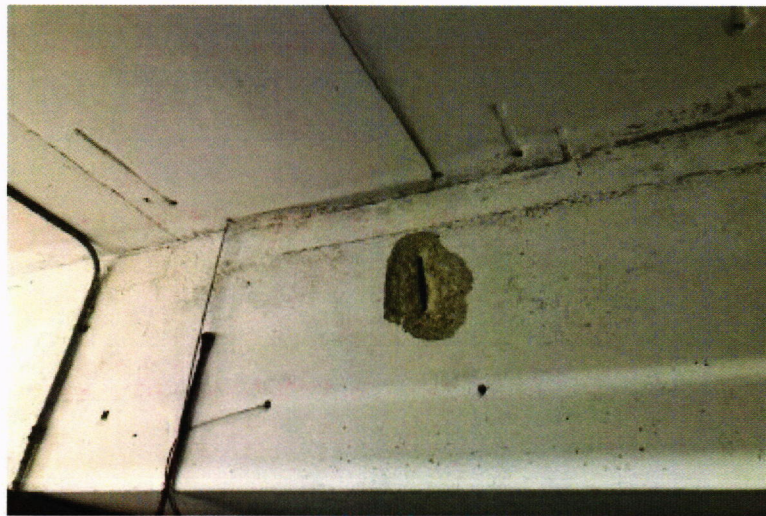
Exposed reinforcement and concrete spalling on precast beam.
